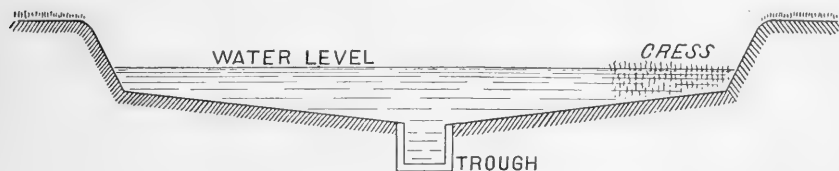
Cross section of cress pond showing arrangement for avoiding damage by the water-cress sowbug.
